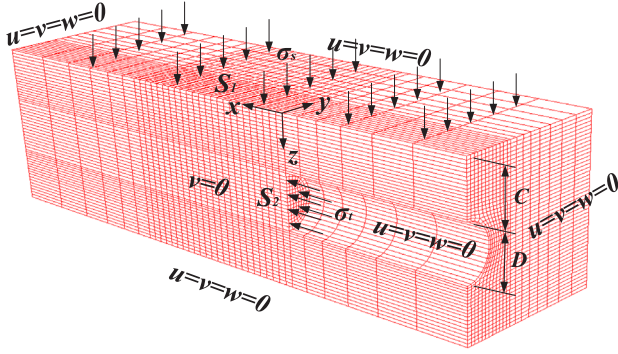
Problem notation and example finite element layout of 3D undrained tunnel face stability.
